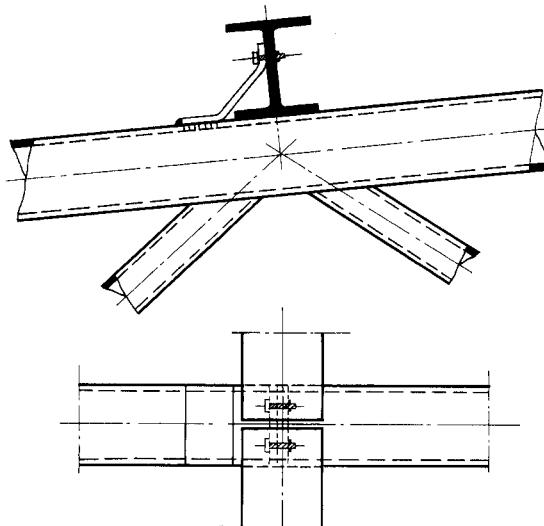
Purlin (rolled I-beam) attachment with a folded corner plate
